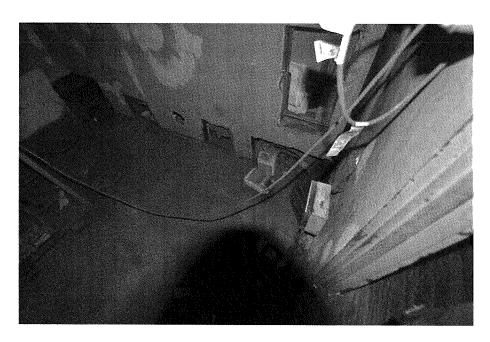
View of a container of refrigerator lubricant observed in the equipment room.
